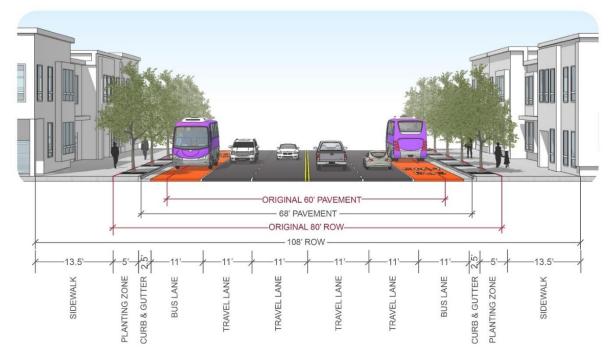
Lafayette Street Recommended Design Concept with Transit Boarding
